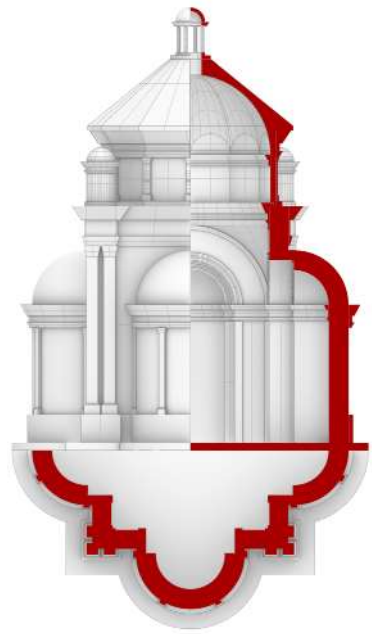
Plan, section and elevation (1:500) of the solution with an umbrella dome and an exterior dodecagonal drum.
